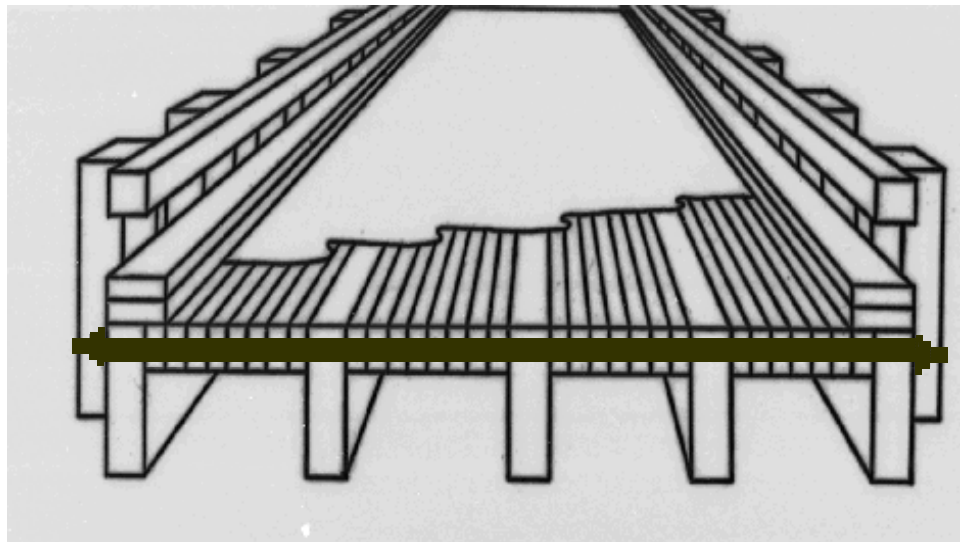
Typical Section of a Stress-Laminated Timber Tee Beam Bridge
